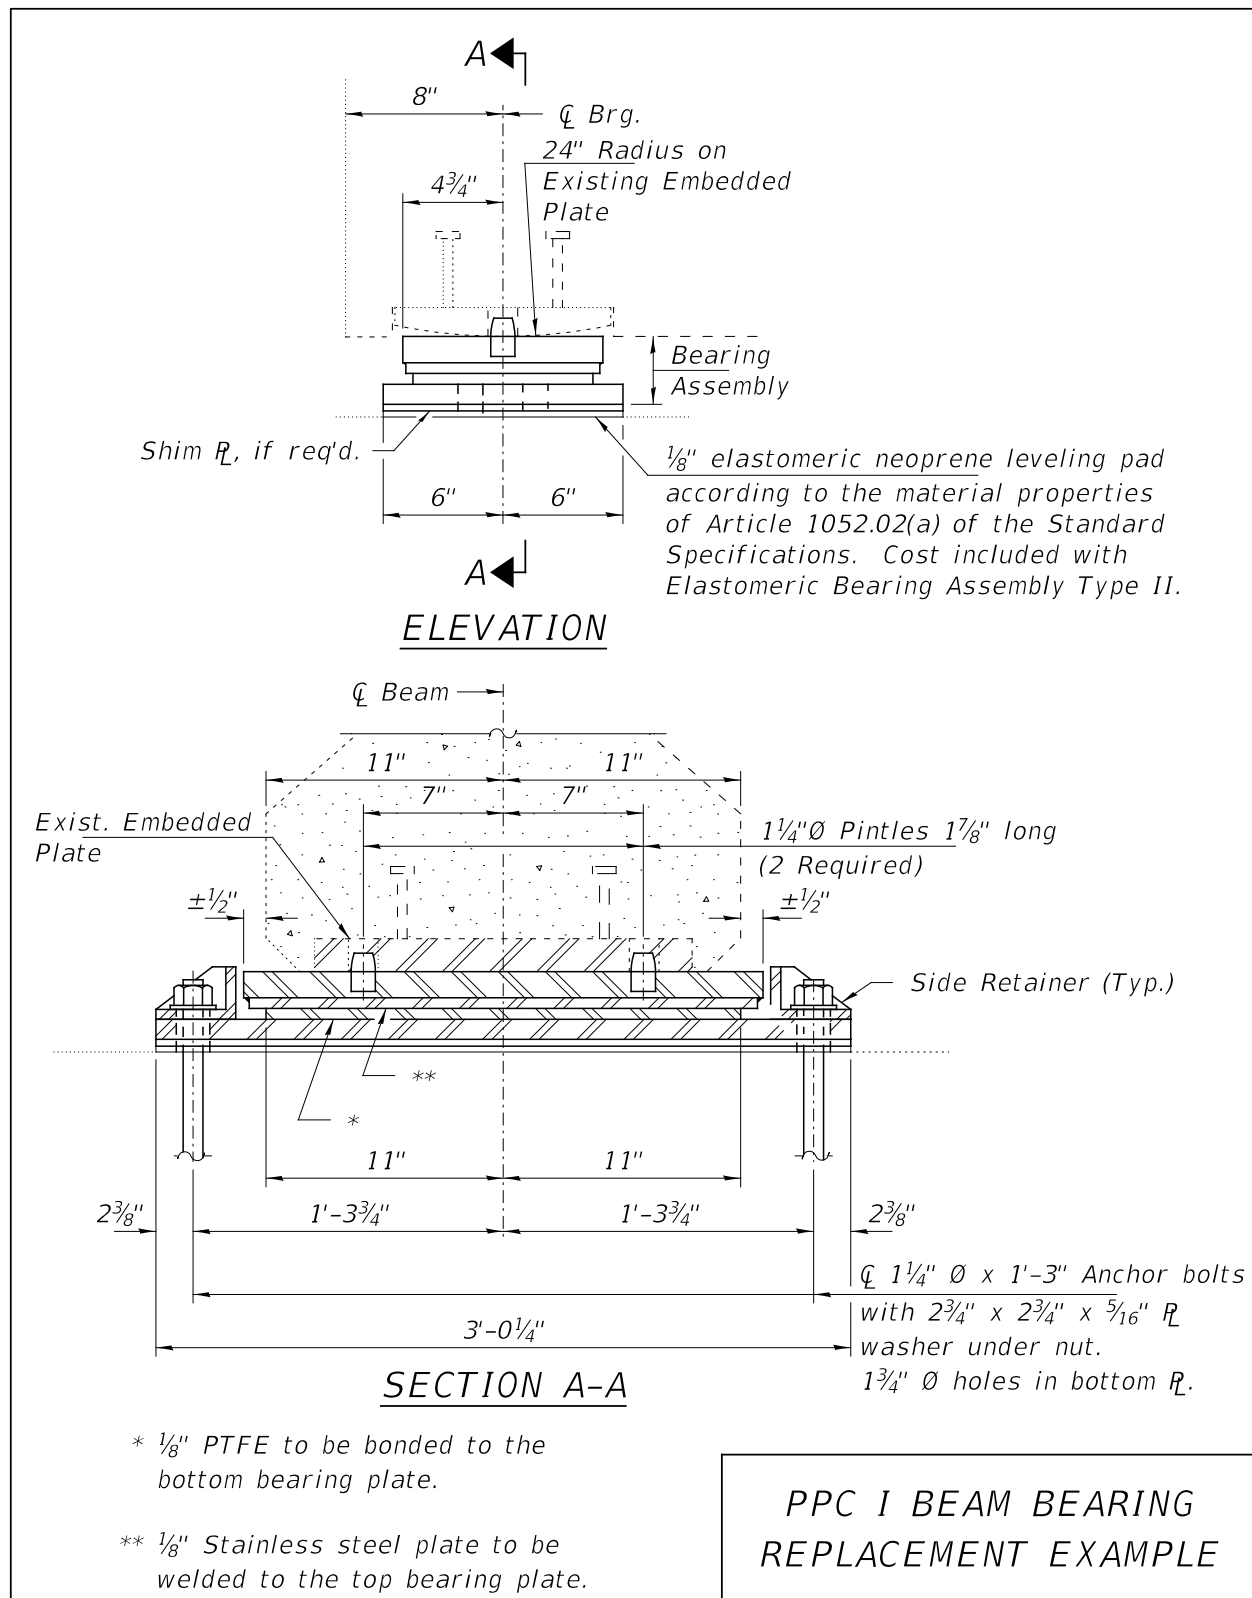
Example – PPC I-Beam Bearing Replacement
